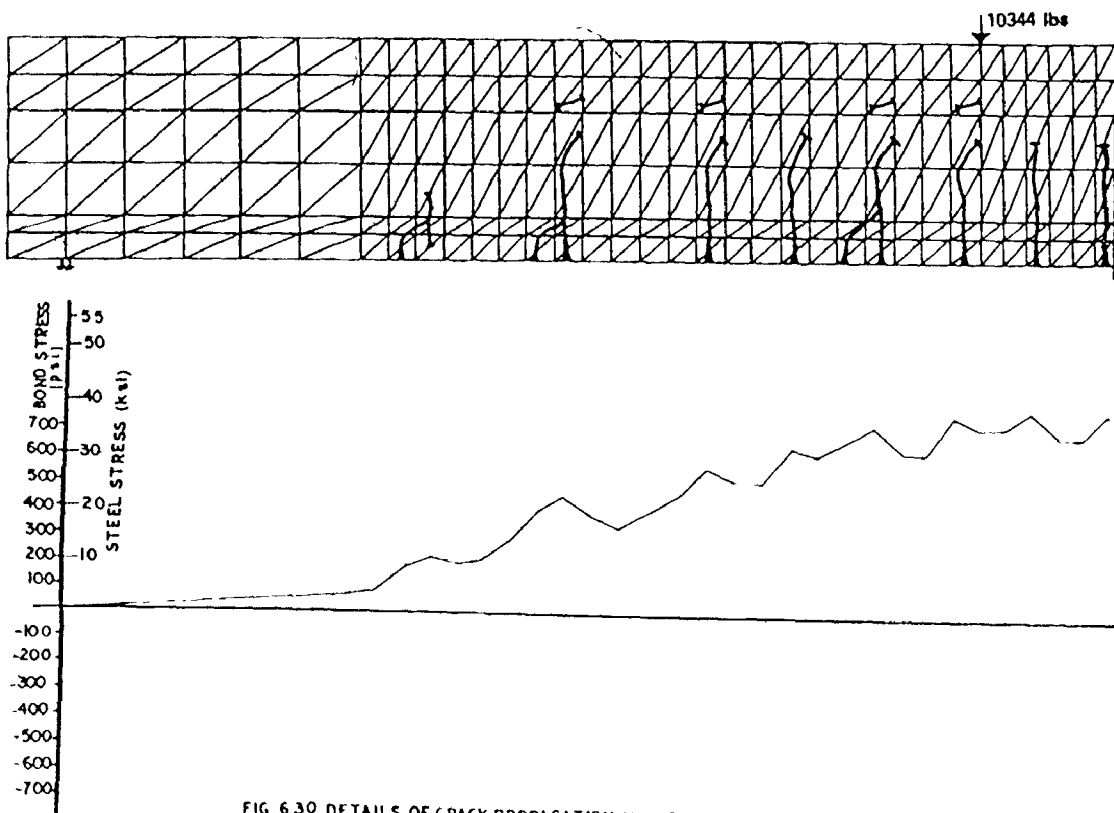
DETAILS OF CRACK PROPAGATION AND CONCRETE, STEEL AND BOND STRESS DISTRIBUTIONS FOR BEAM(7/1)
